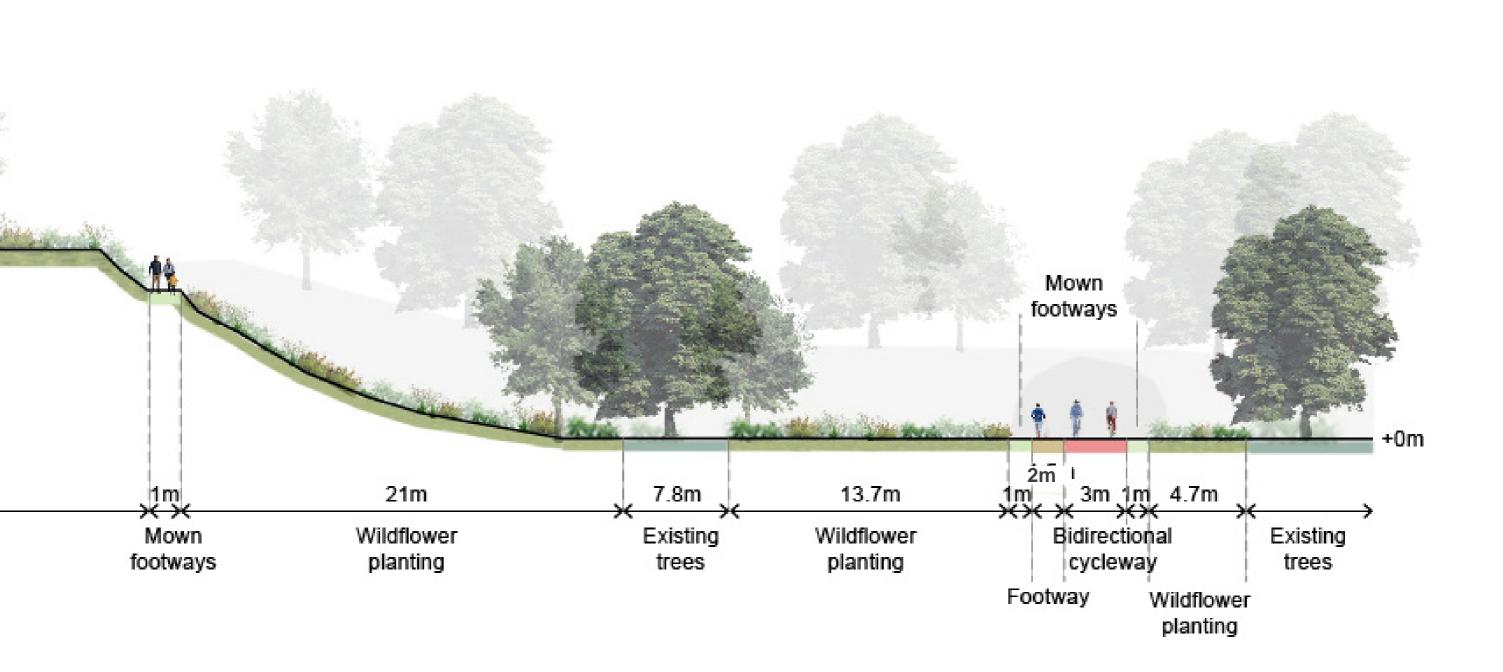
Section through Haghill Cross Civic Space and Todd Street Open Space
